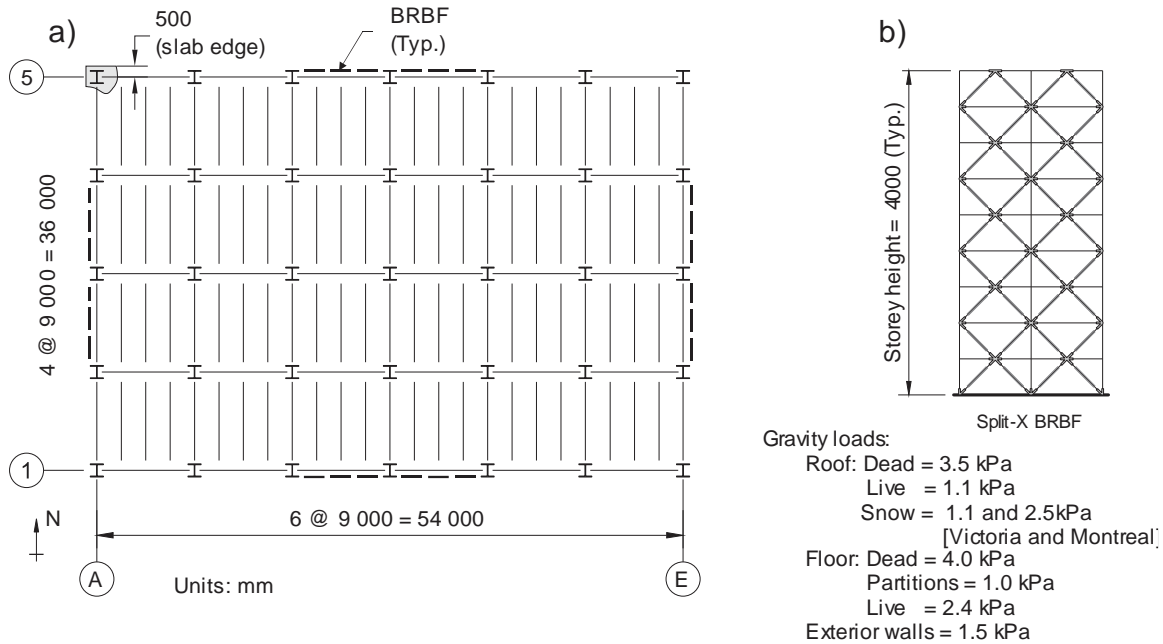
Buildings studied: a) Plan view; b) BRBF elevation and design gravity loads.
